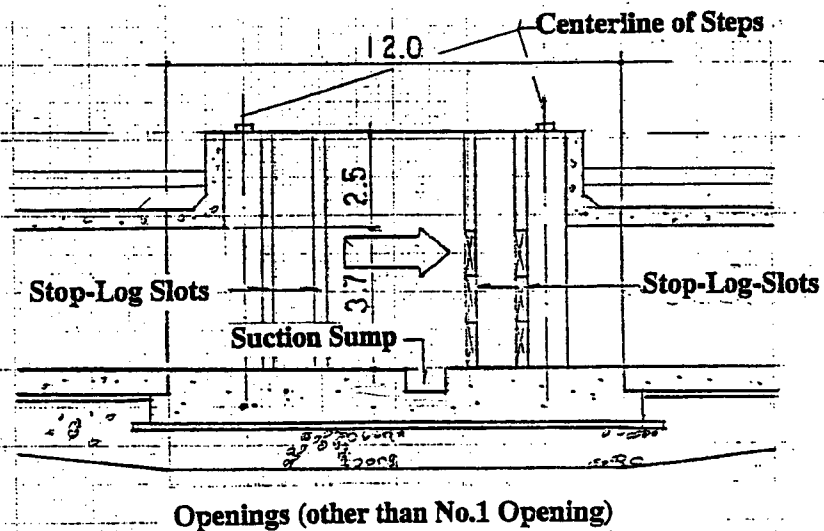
Longitudinal Section of Openings other than No.1 Opening
